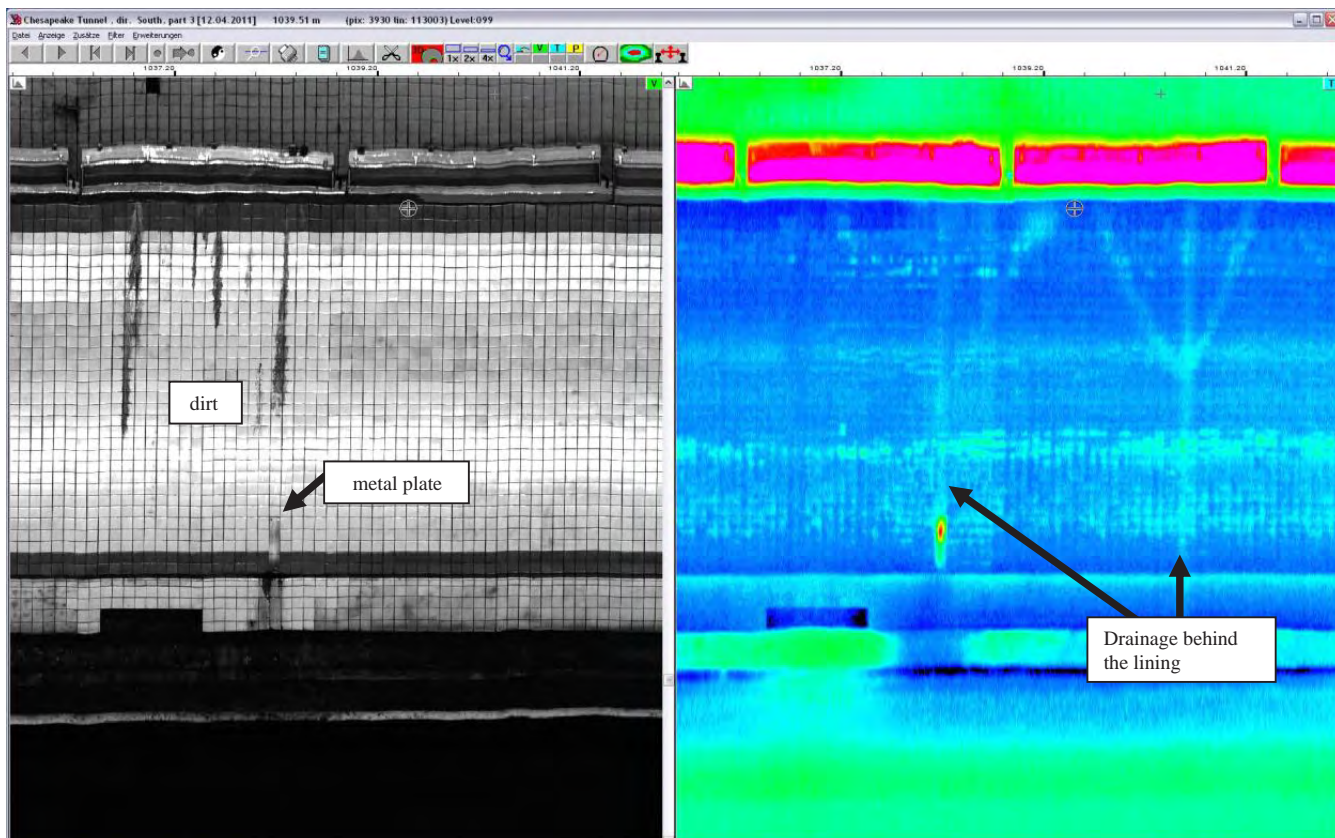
Visible structures at the surface and drainage behind lining surface (south, 1,038 m).
